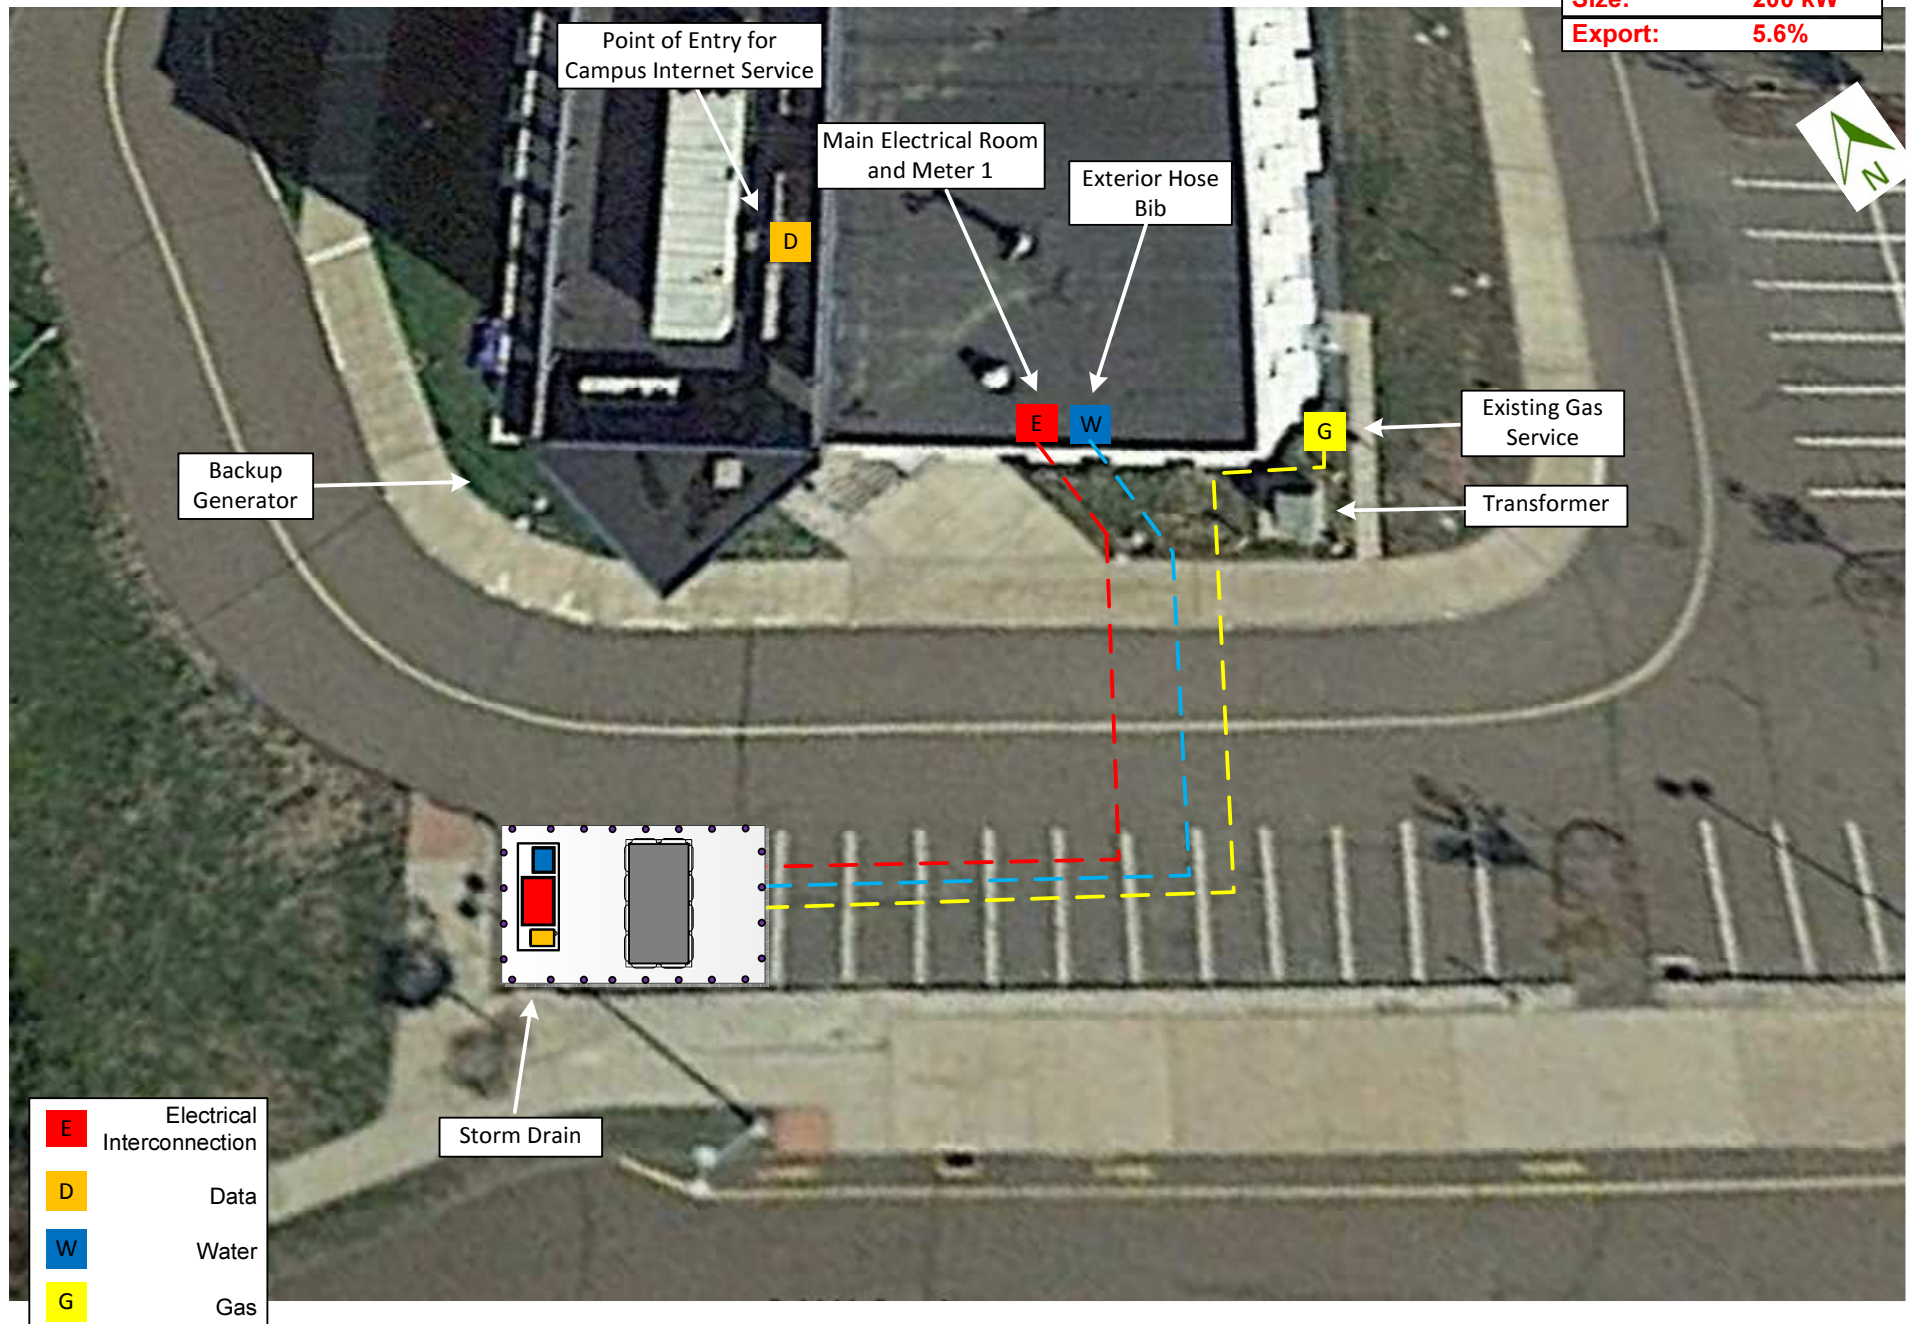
Meter 1 200kW System Conceptual Site Plan
